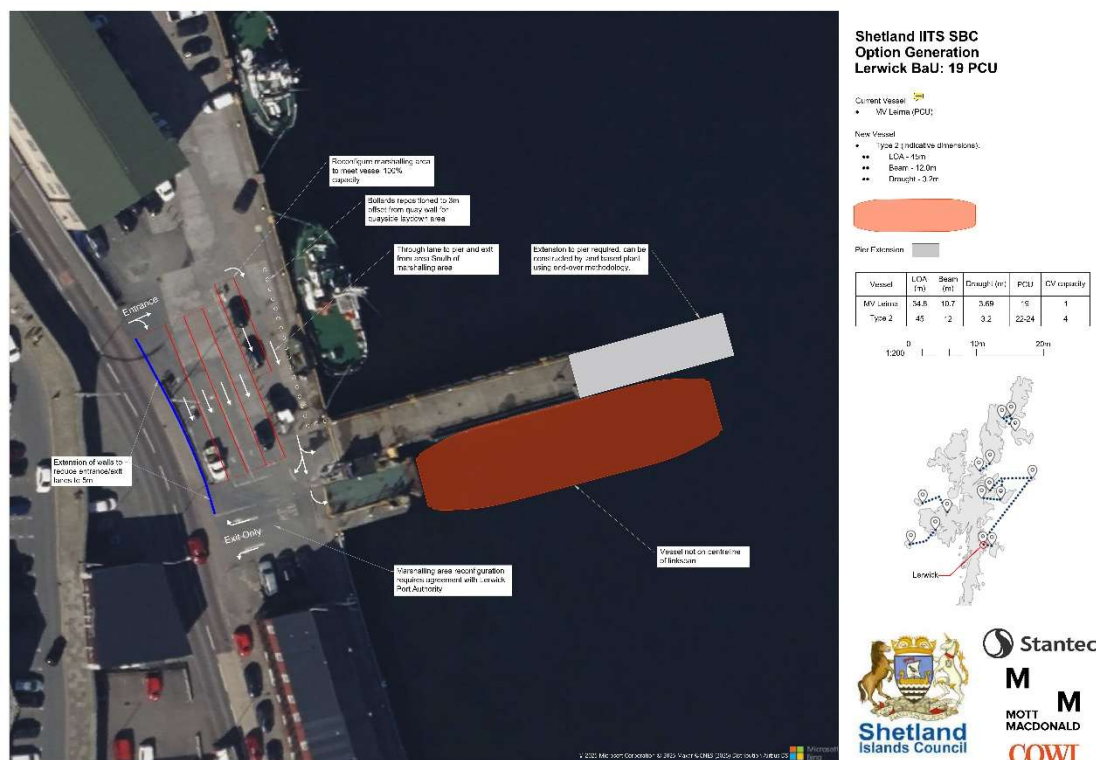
Bressay – Lerwick, Lerwick BaU
